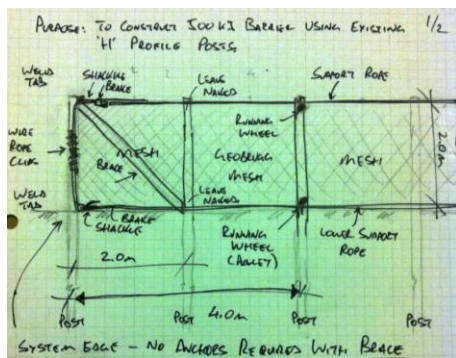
Simple 'proof of concept' sketch showing that it would be possible to attach a catch fence to a retaining wall simply extending 'H' Piles 2m above wall height
